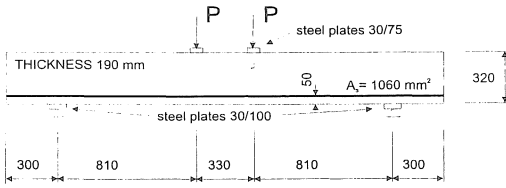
Geometry of Leonhardt and Walther's reinforced concrete beam.
